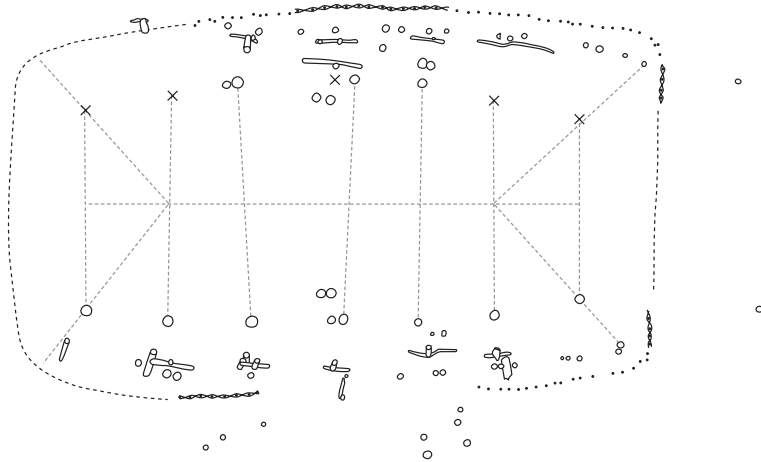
Floor plan of the Oostpolder farmhouse, 1:150 (after Kok 1999, figure 23, p. 46).
